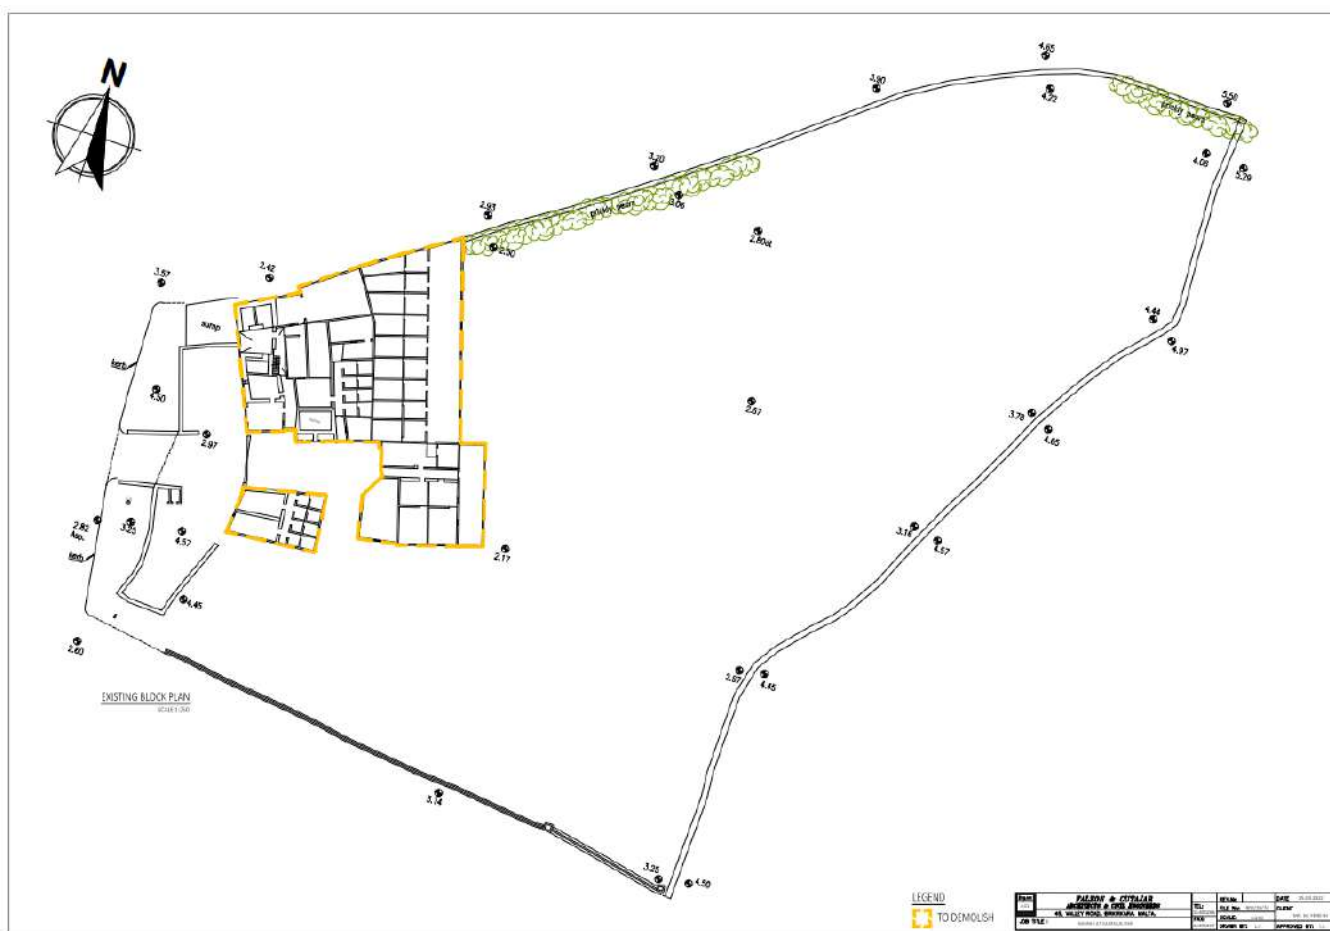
SITE PLAN AS EXISTING SHOWING LOCATION OF SUMP NEAR SITE DESIGNATED FOR PROPOSED DEVELOPMENT (PA/03071/22)
